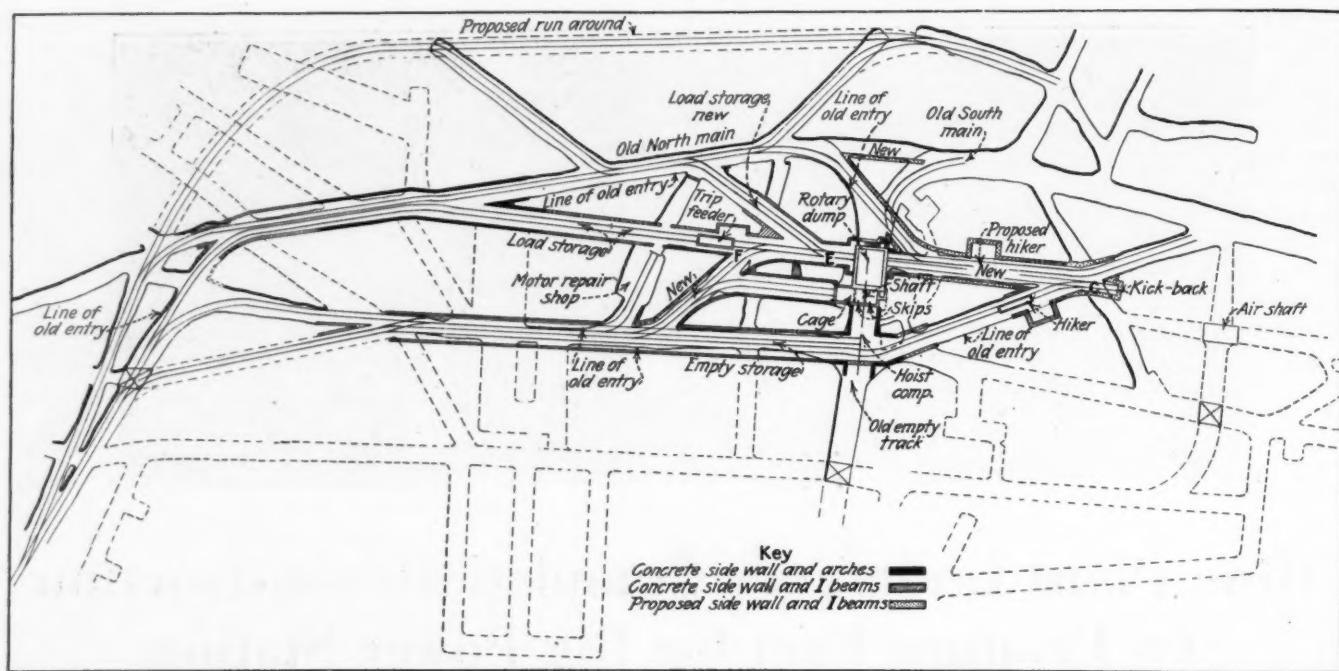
Shaft Bottom Layout Showing the Concrete Reinforcing
